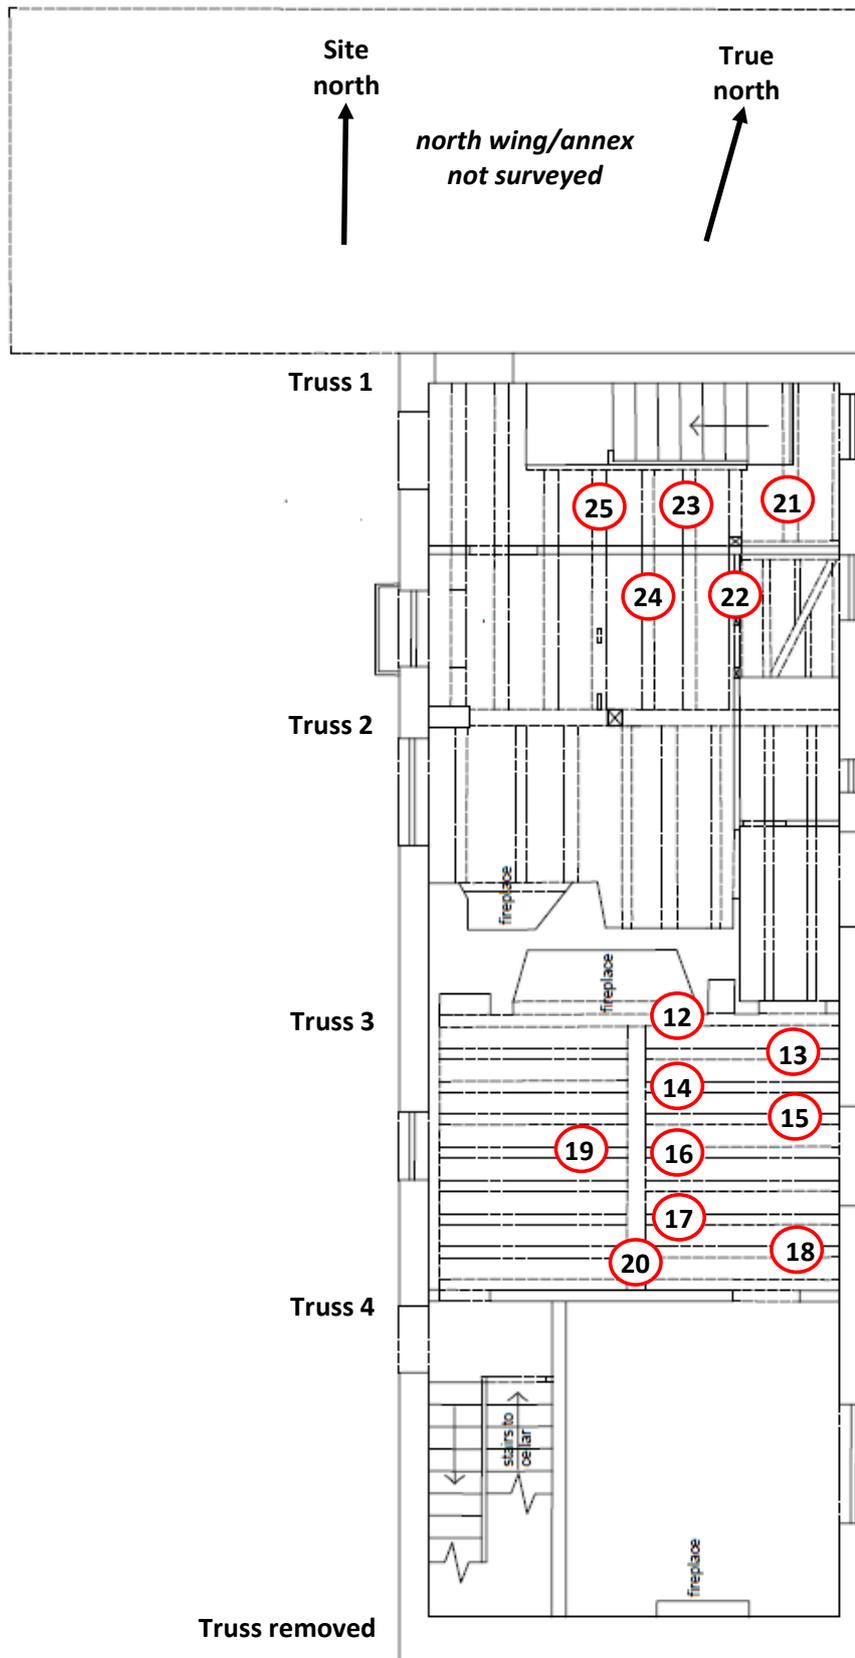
Plan at ground-floor level to show the locations of the sampled timbers (after Rebecca Lane 2021)
